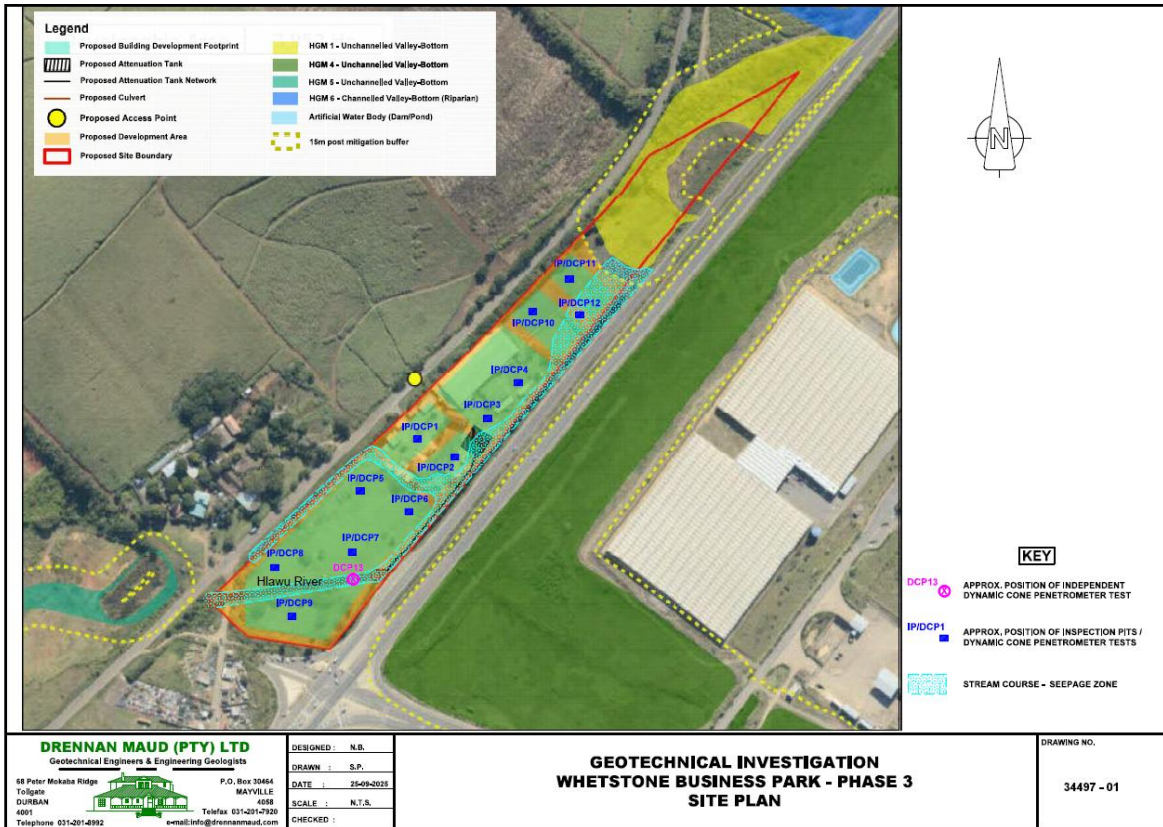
Geotechnical Investigation Layout Plan (Drawing 34497-01) showing investigation locations and site conditions (Drennan Maud, 2025)
